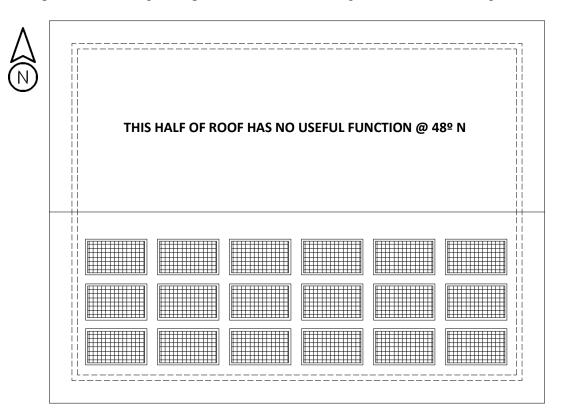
18-Panel South-Facing Solar Panel Layout, 40-Foot x 30-Foot (1200SF) Rambler
